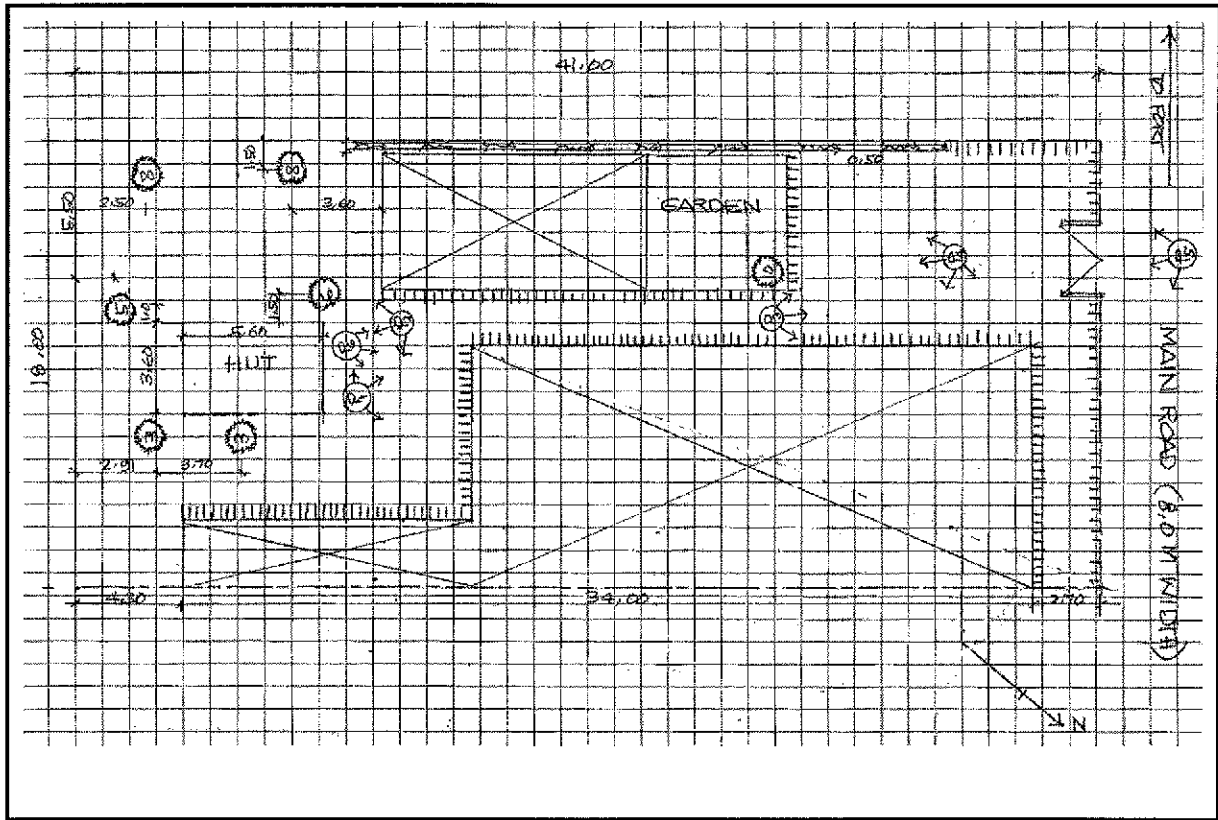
SITE LAYOUT FOR CGS CATBALONGAN
